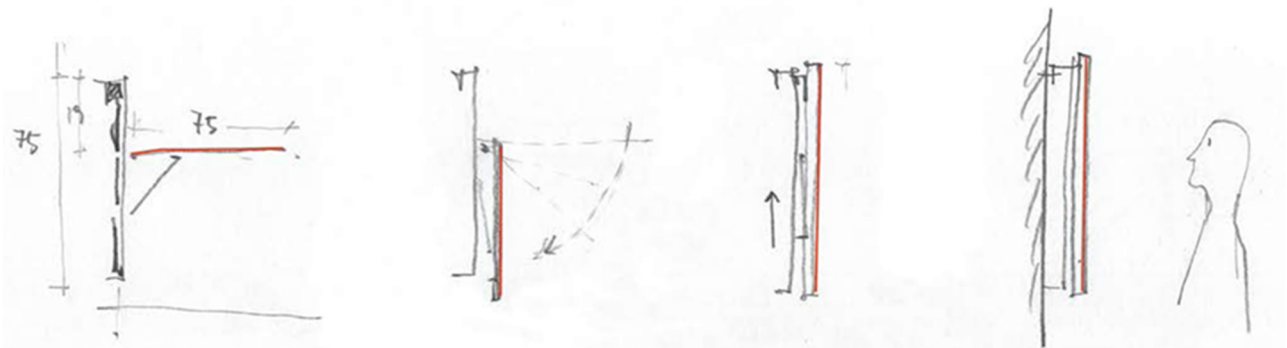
The *Ribalta* in its two locations: positioned in the balcony and hanging on a wall. Drawing by Arch. Edoardo Turozzi.
